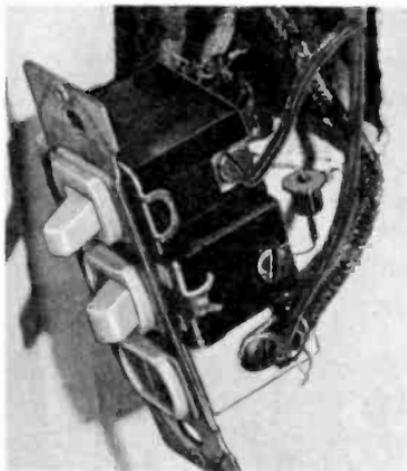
Photo shows the "top hat" silicon rectifier used to dim the fixture lights.
